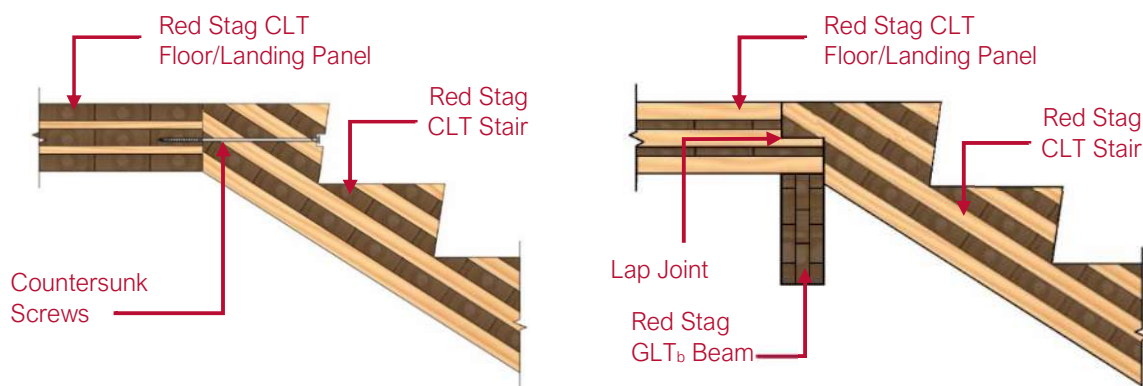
Example of Red Stag CLT stair panel upper connection to CLT landing/floor panel.
